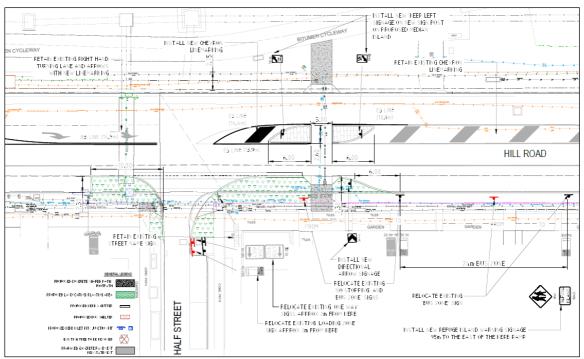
A concept plan of a proposed pedestrian refuge island in Hill Road, Wentworth Point immediately north of Half Street
